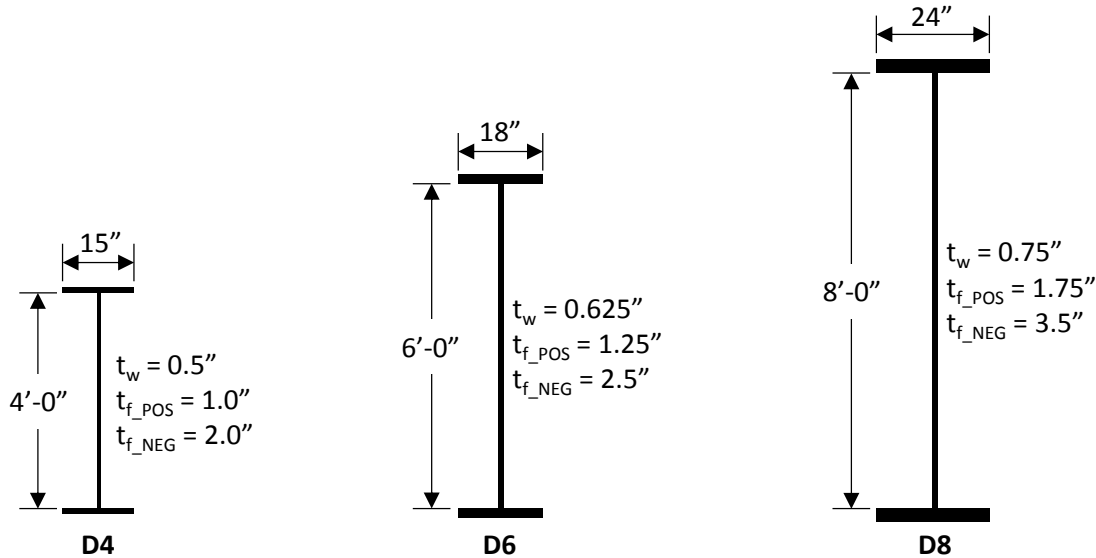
Cross-Sections Used for the I-Girder Parametric Study
